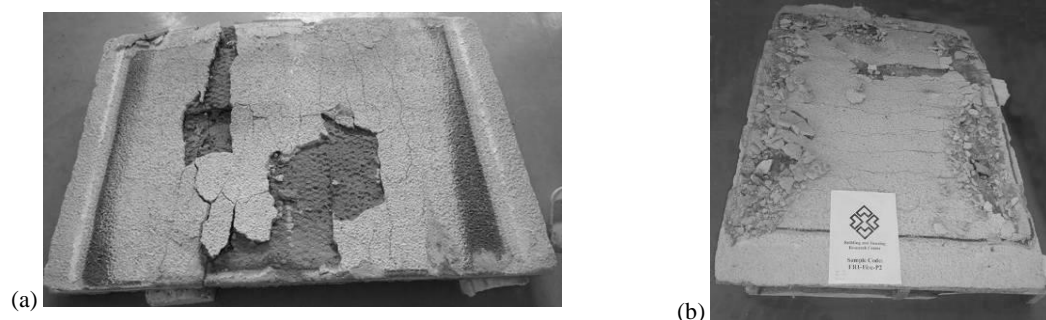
(a) Cracking and spalling of the fire protective coating in specimen FR1-Fire-P1 at the end of the test; (b) Specimen FR1-Fire-P2 after the fire test
